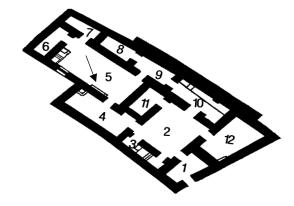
Ur. Plan of No. 4 Paternoster Row highlighting the bench discovered in room $\mathbf{5}$
